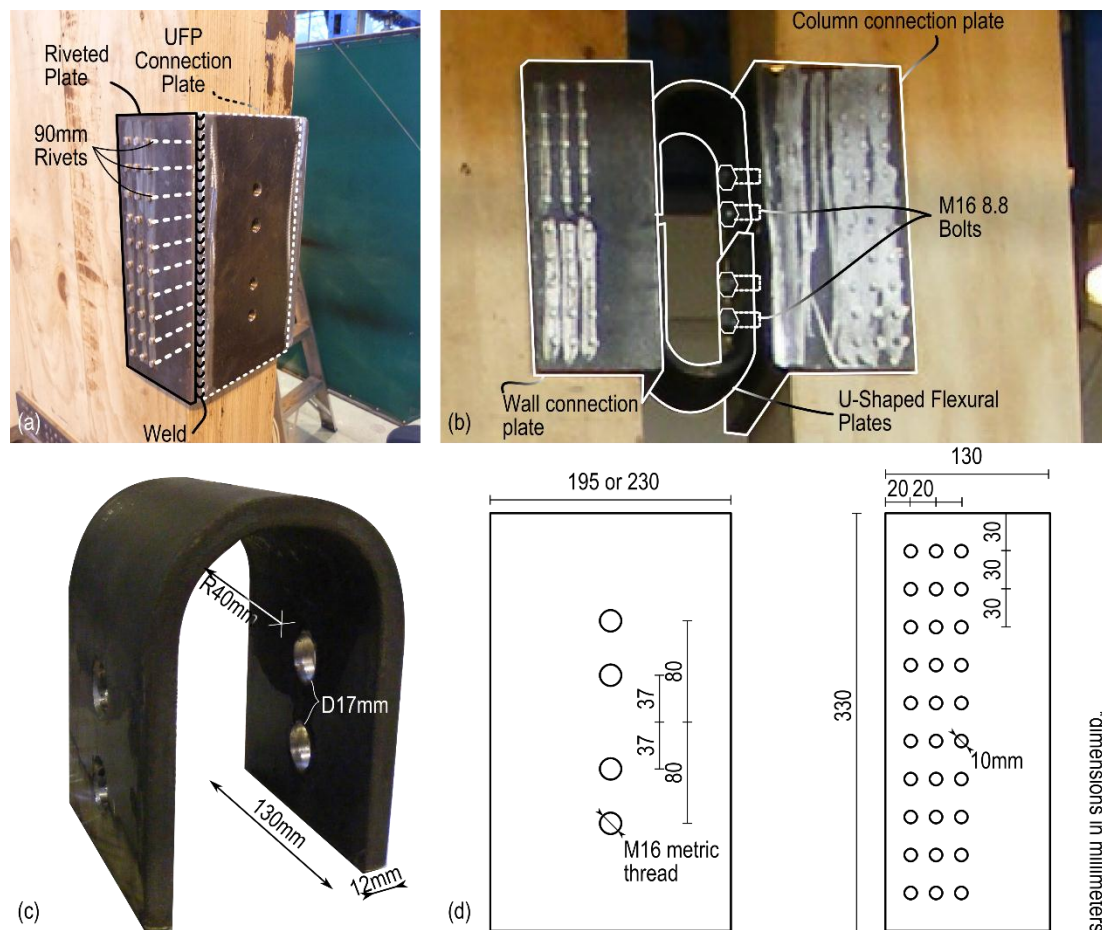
UFP connection: (a) detail of the welded connection and riveted plates; (b) detail of the final setup; (c) U-shaped Flexural Plate details; (d) Technical details of the connection plate.
